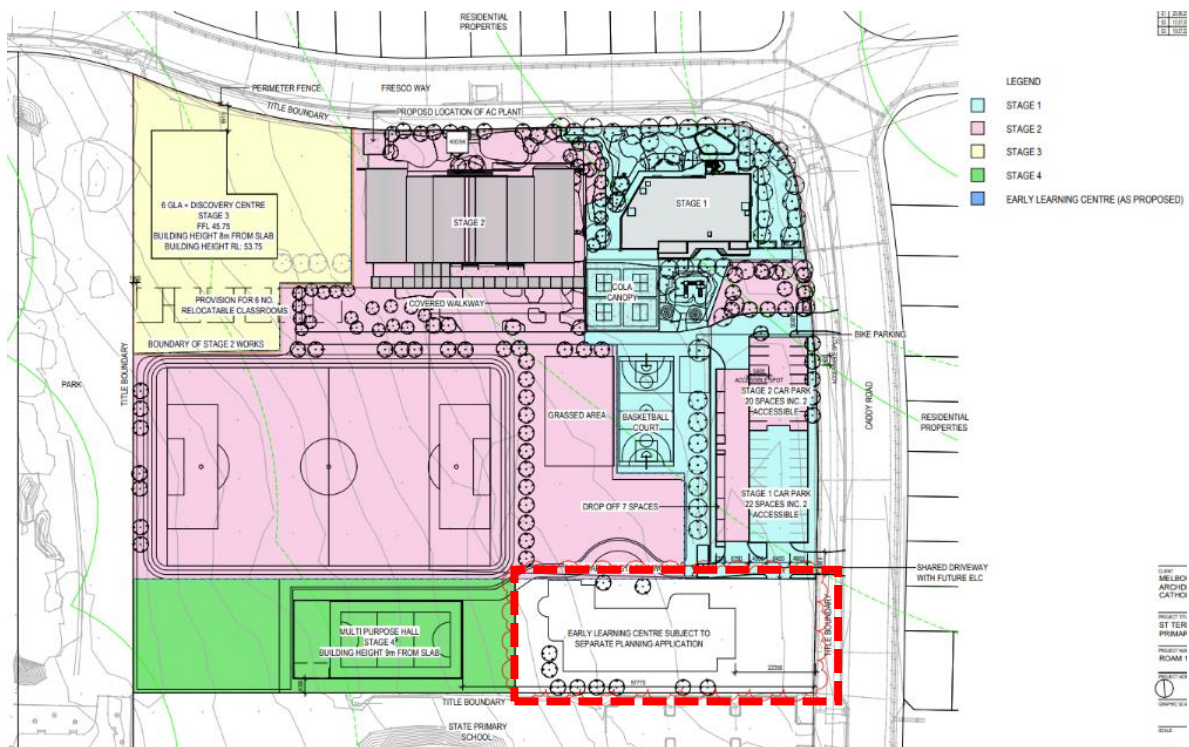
Endorsed Masterplan and Staging Plan under PA2201762-1
